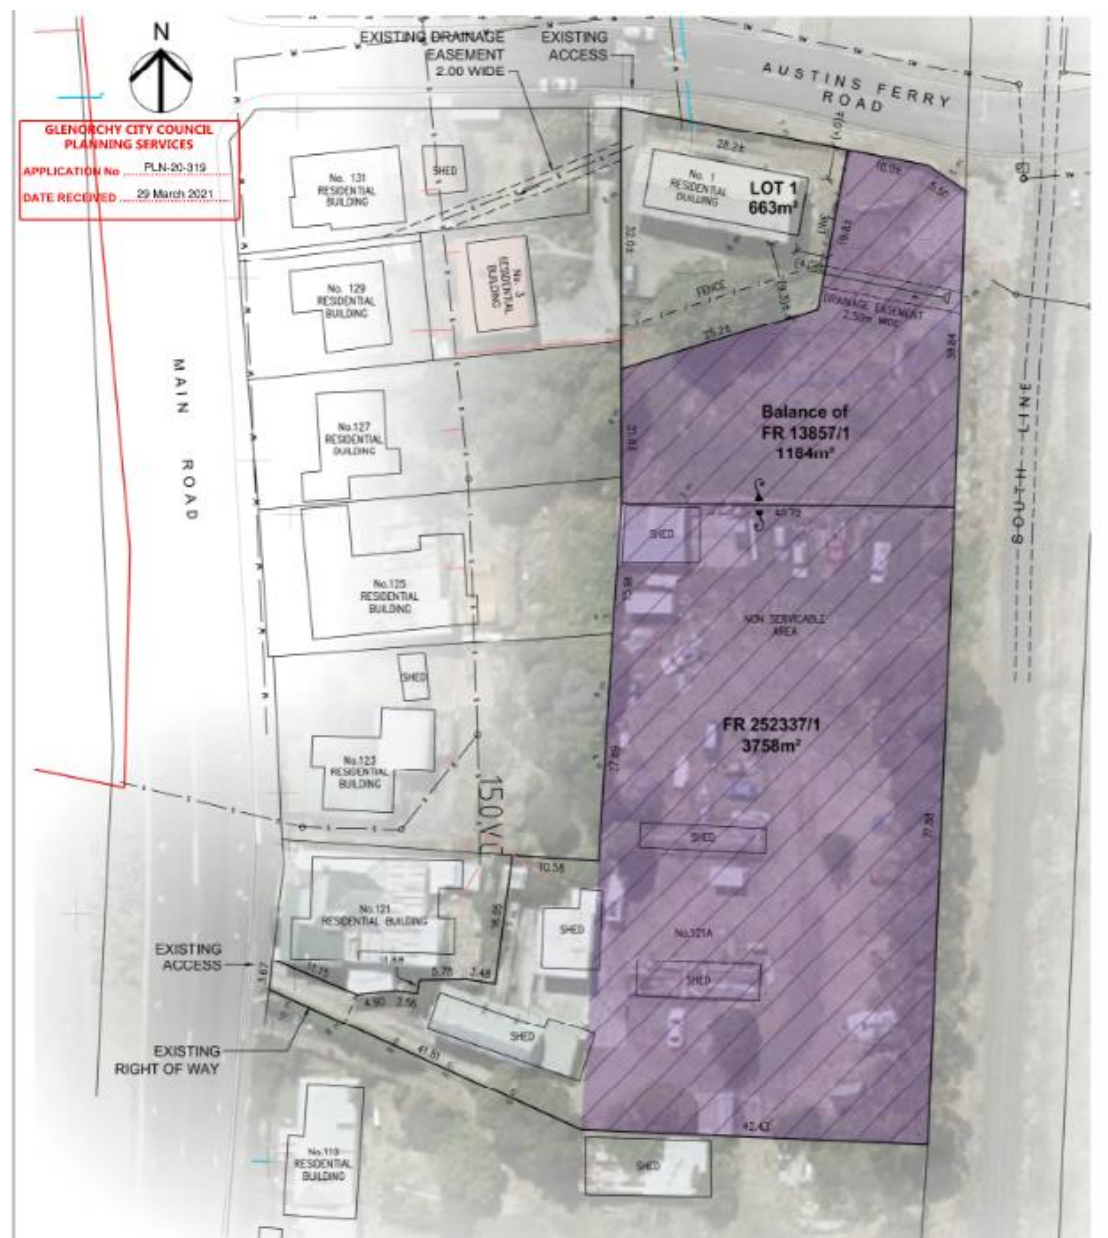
Site plan 1 Austins Ferry Road and 121A Main Road, Austins Ferry.
